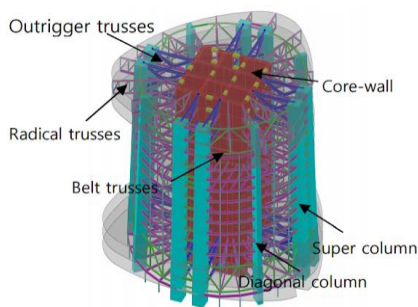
Outrigger, core wall and mega frame system^[18] Figure 2: 3-D view of outrigger and belt truss
